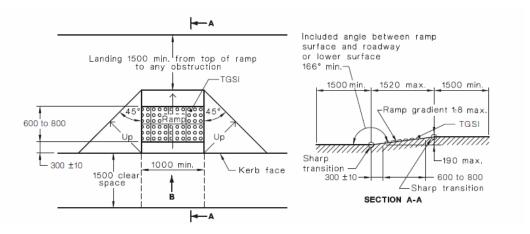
Extract from Appendix C of AS1428.4.1:2009 addressing the detailing of kerb ramps.
